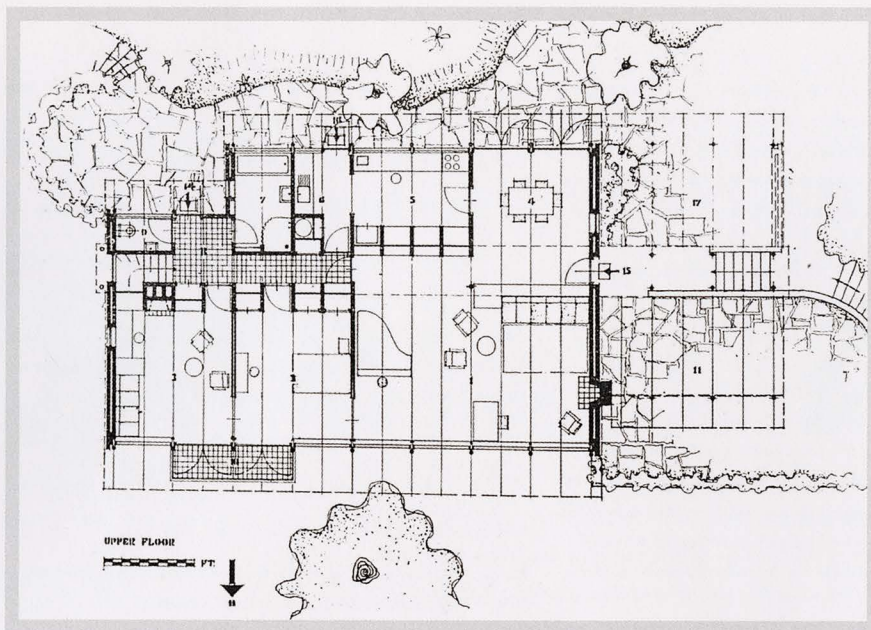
Plan of Winckley House, Pretoria (Stauch 1945:210)
